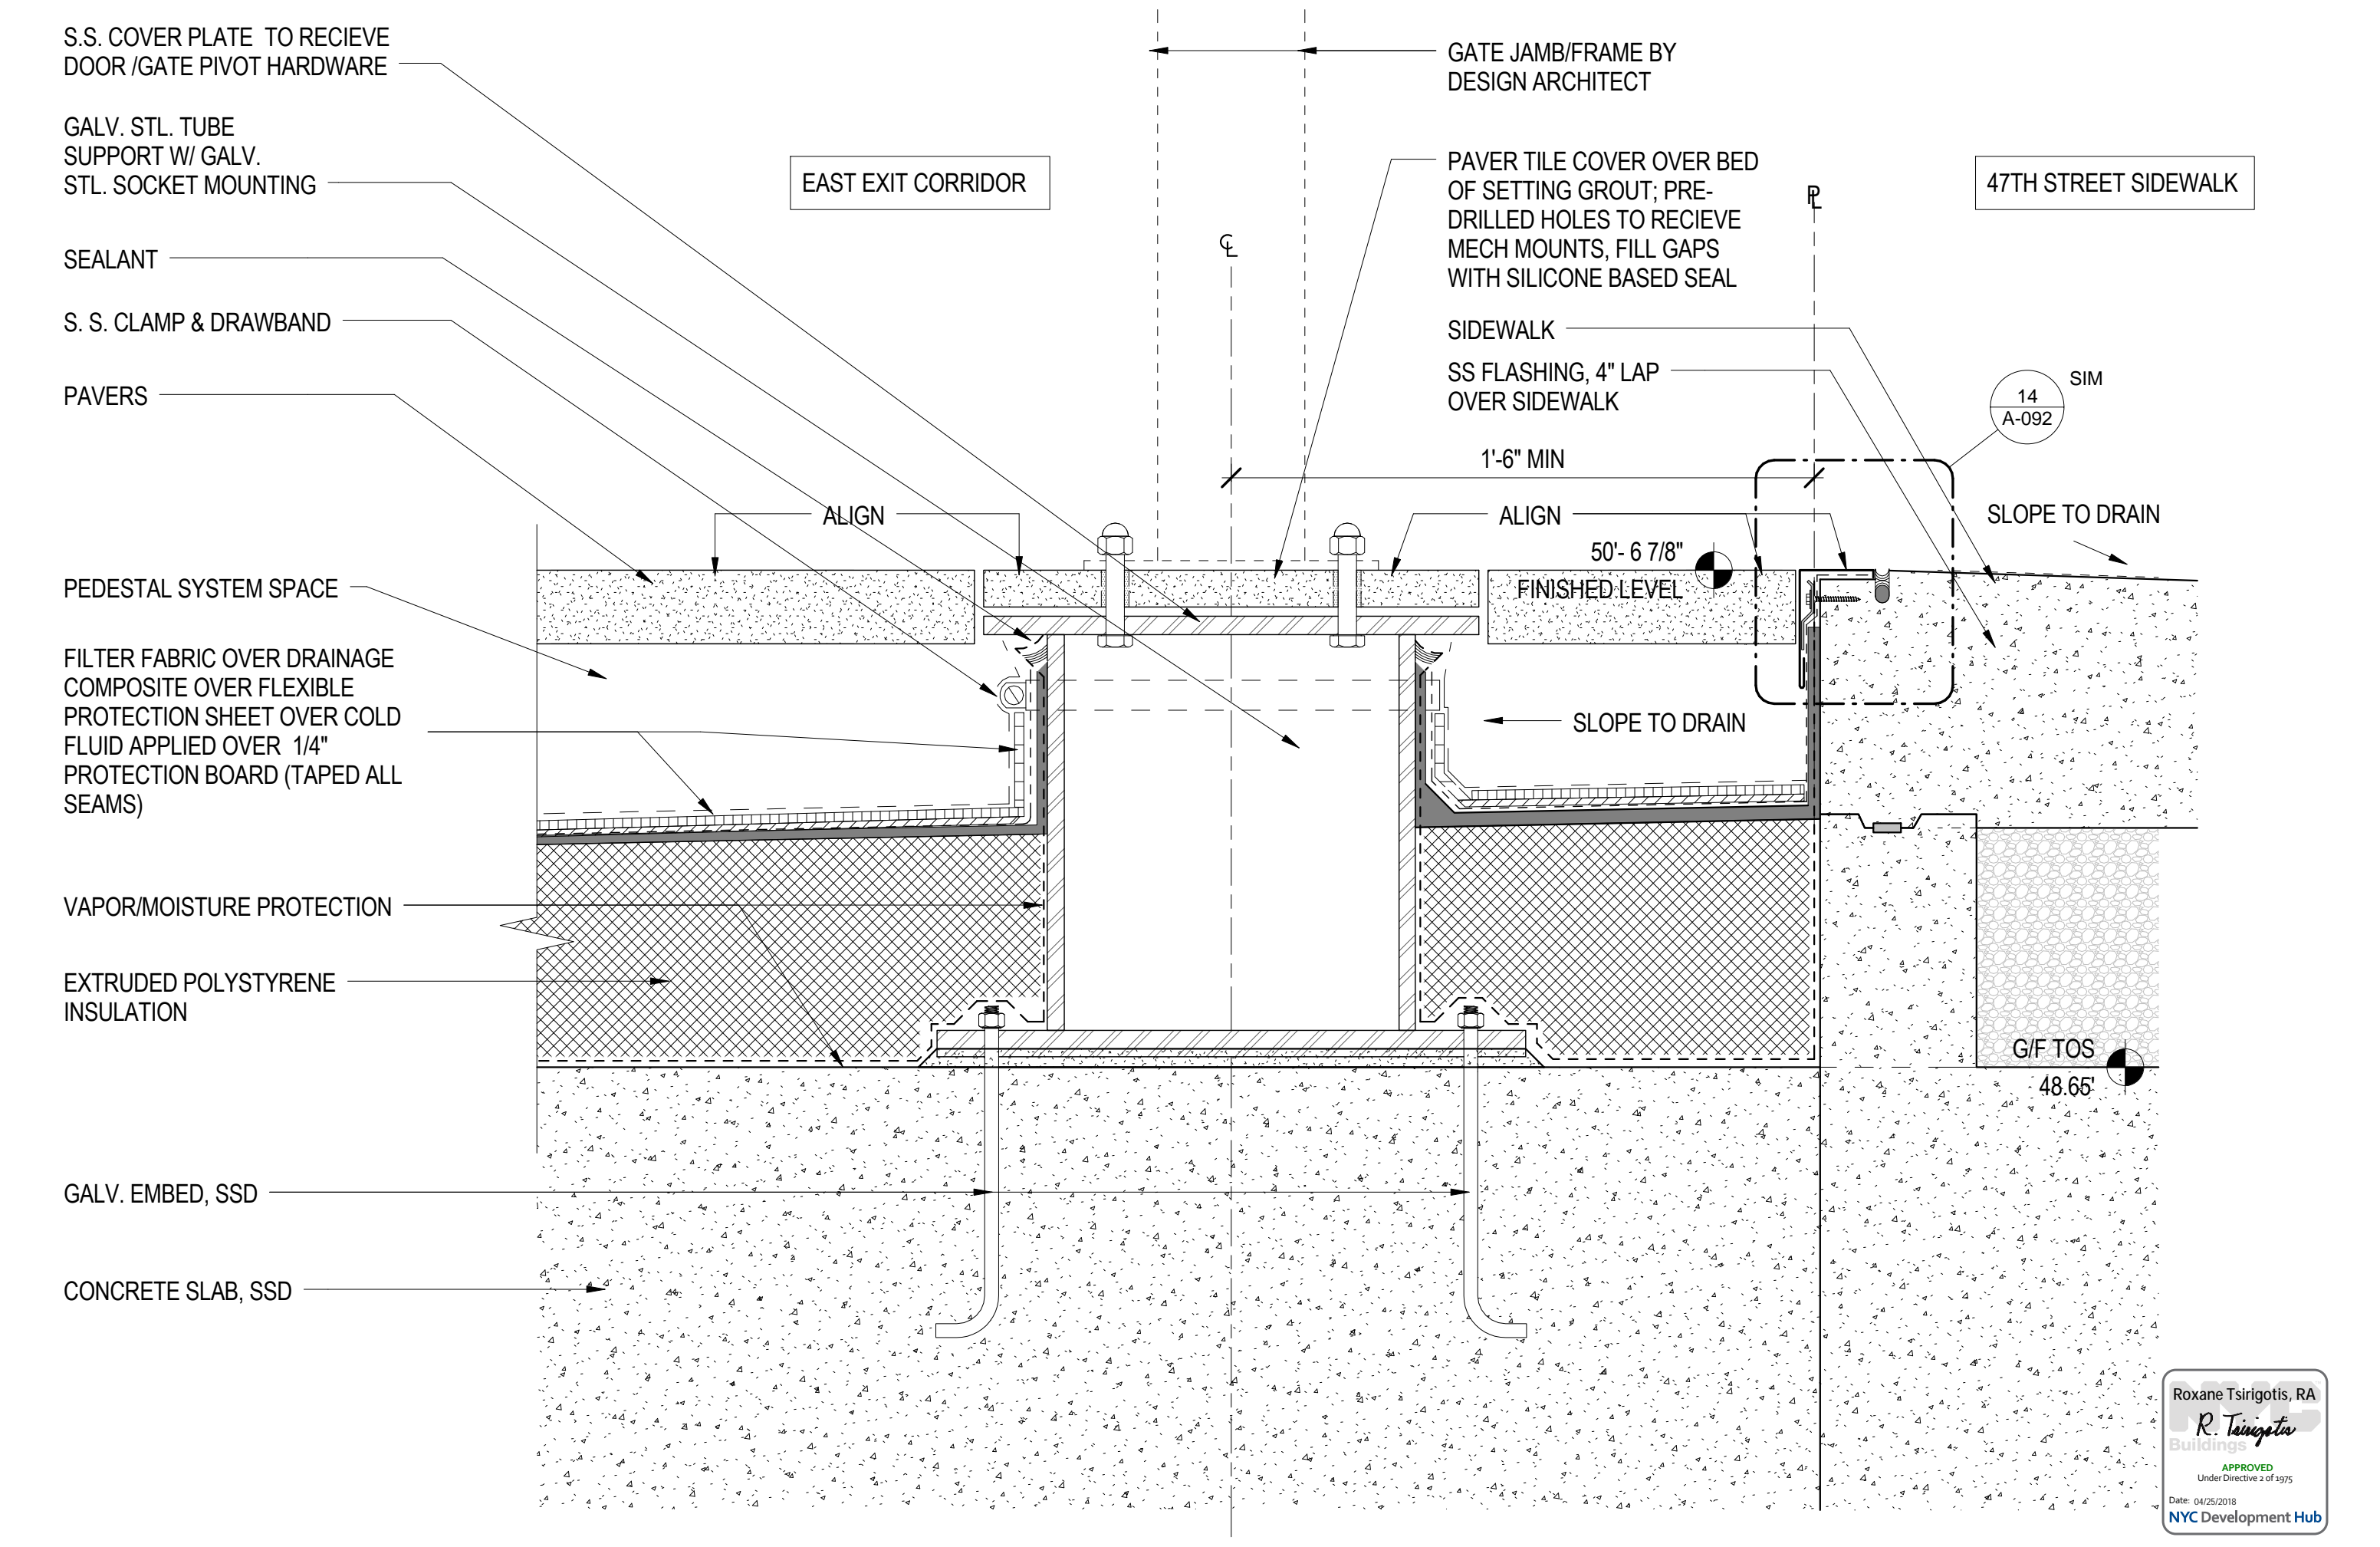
DETAIL AT ADJ BLDG - EAST EXIT CORRIDOR 11
